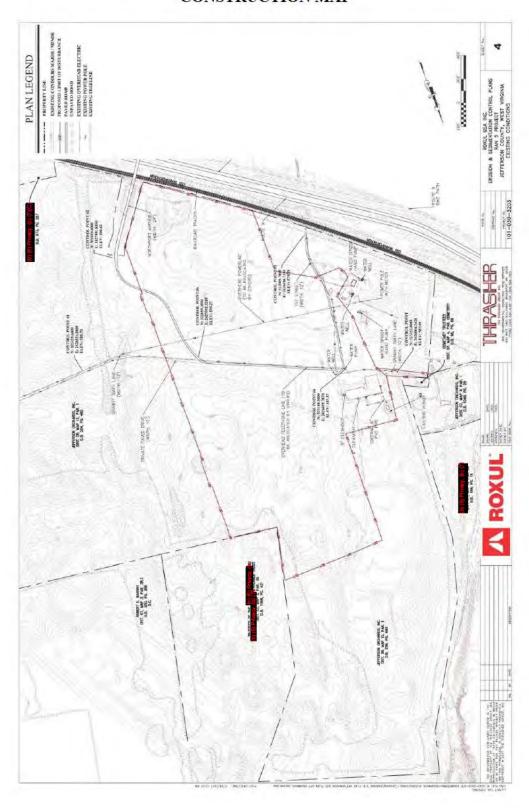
EXHIBIT AA - WVDEP APPROVED ROCKWOOL STORMWATER CONSTRUCTION MAP CLOSEUP
